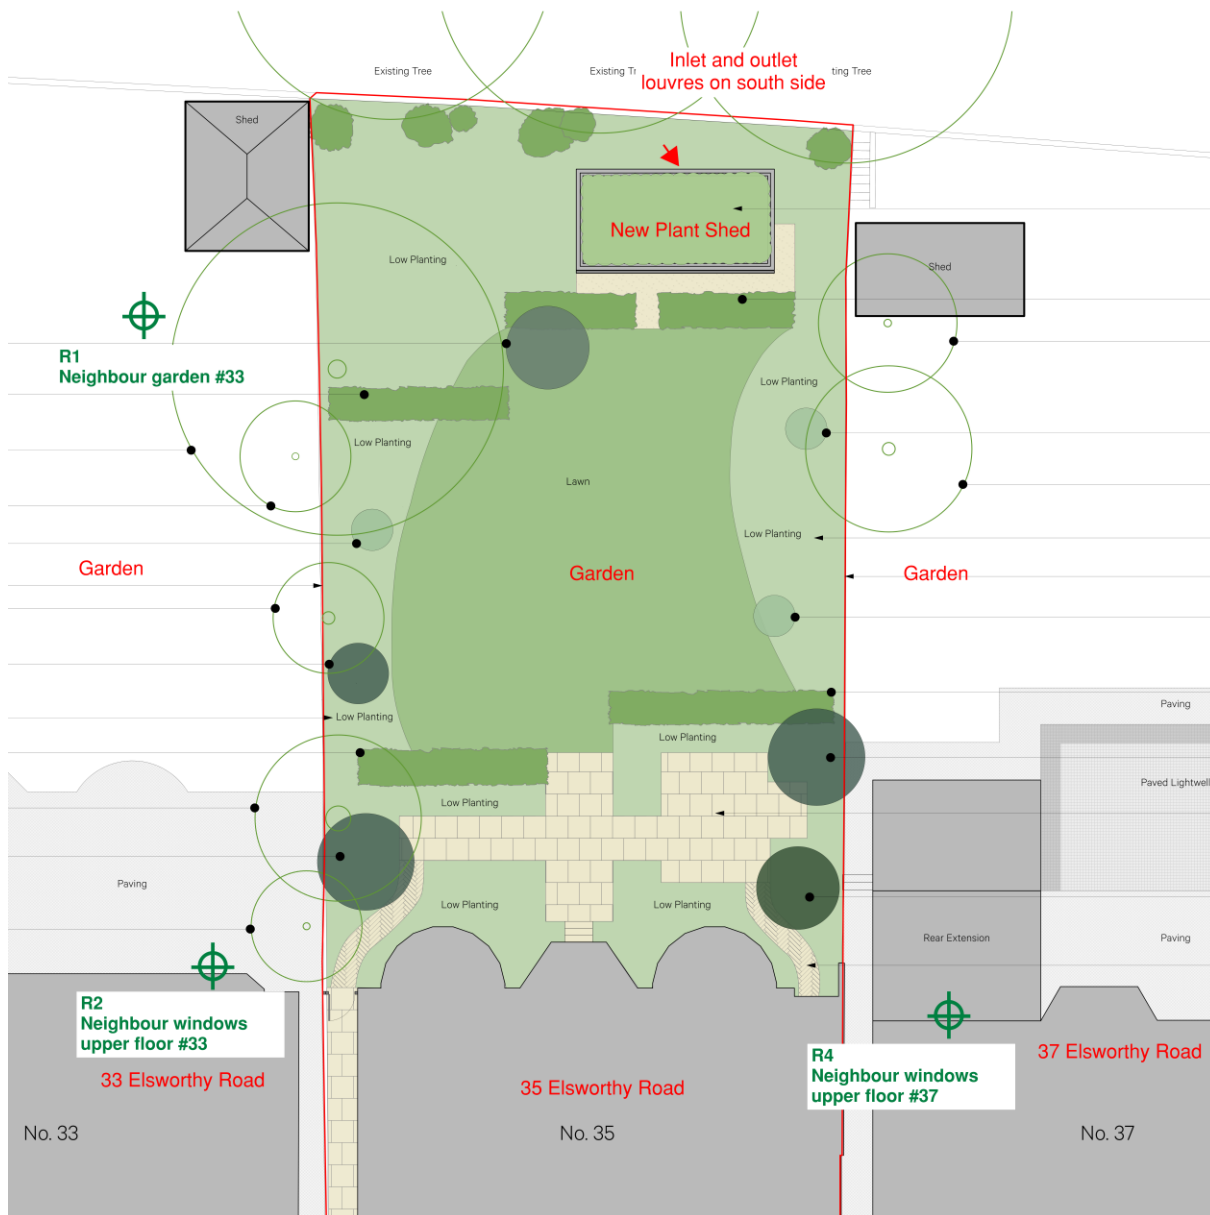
Site Plan showing Location of Plant Shed and Sensitive Receptors
